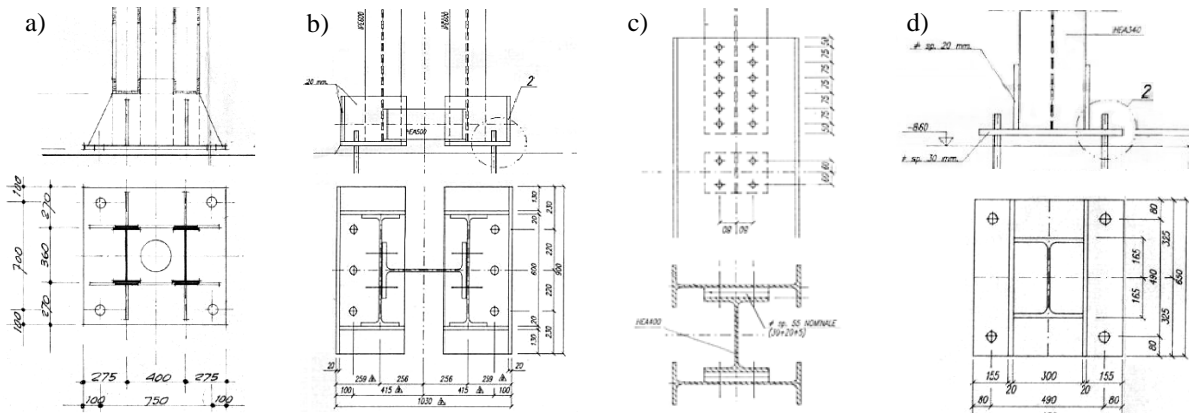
Original design drawings: (a) type-A columns, (b) type-B columns, (c) detail of top of type-B columns, (d) type-C columns.
